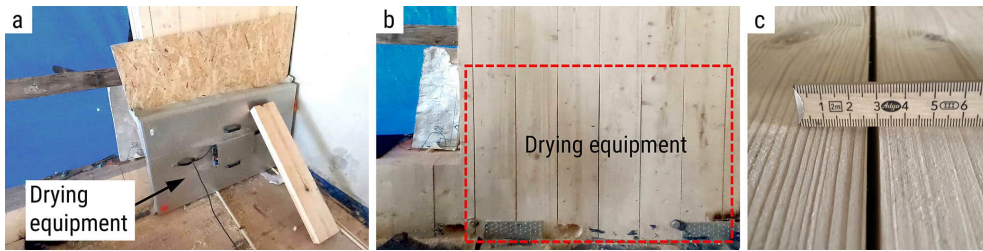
Installed drying equipment (a) and large cracks visible (b, c) after moisture dry-out in building A.
